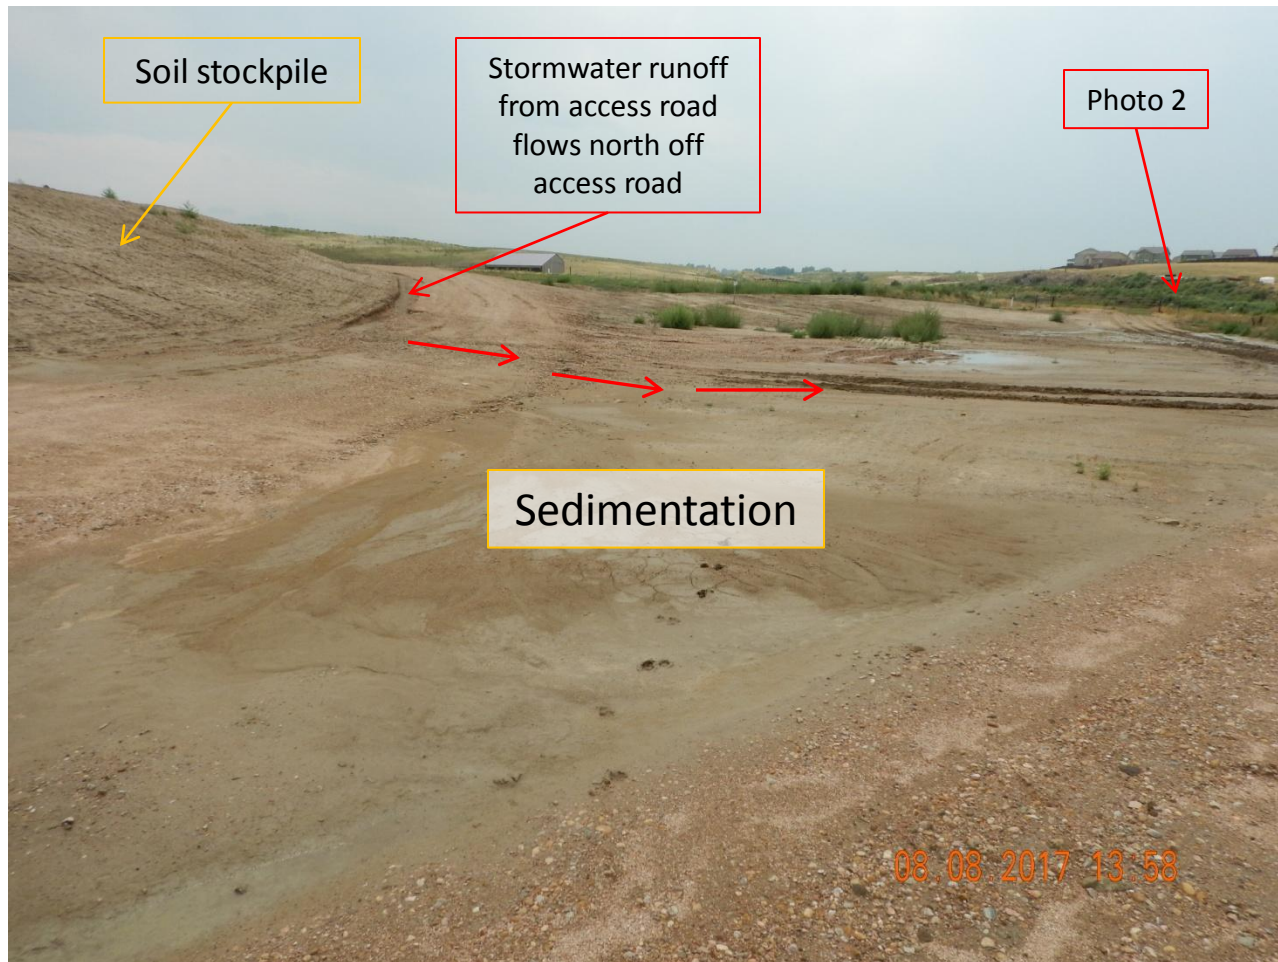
Photo taken from the northern Rancho Pad, facing West. Sediment is being depositing and settling out (sedimentation) from rill erosion occurring on a soil stockpile. Stormwater runoff is coming from the access road and the northern location which then travels west and causing erosion off location into a wetland.
